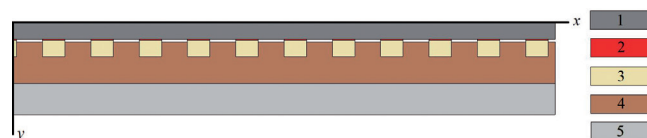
Railway track on the bridge: 1 – rail, 2 – dampers, 3 – sleepers, 4 – ballast, 5 – supporting structure.
